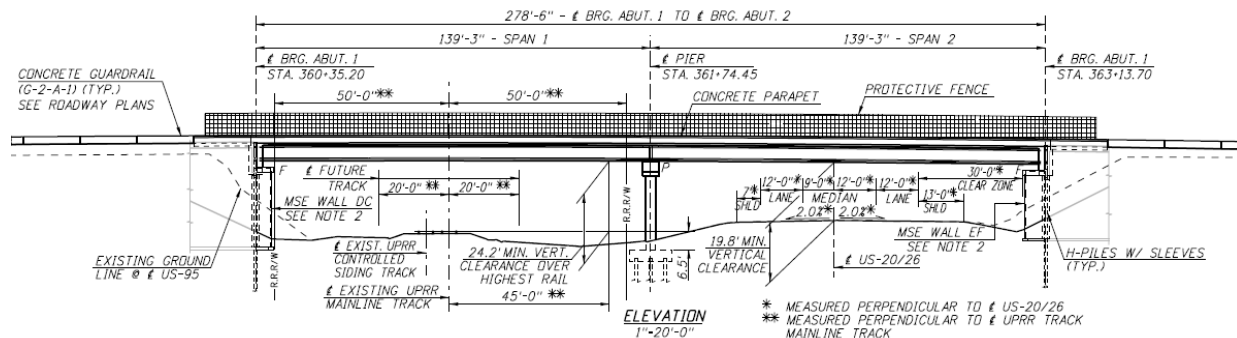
Elevation View of US-95 over US-20/26 and UPRR at Parma (NTS)
